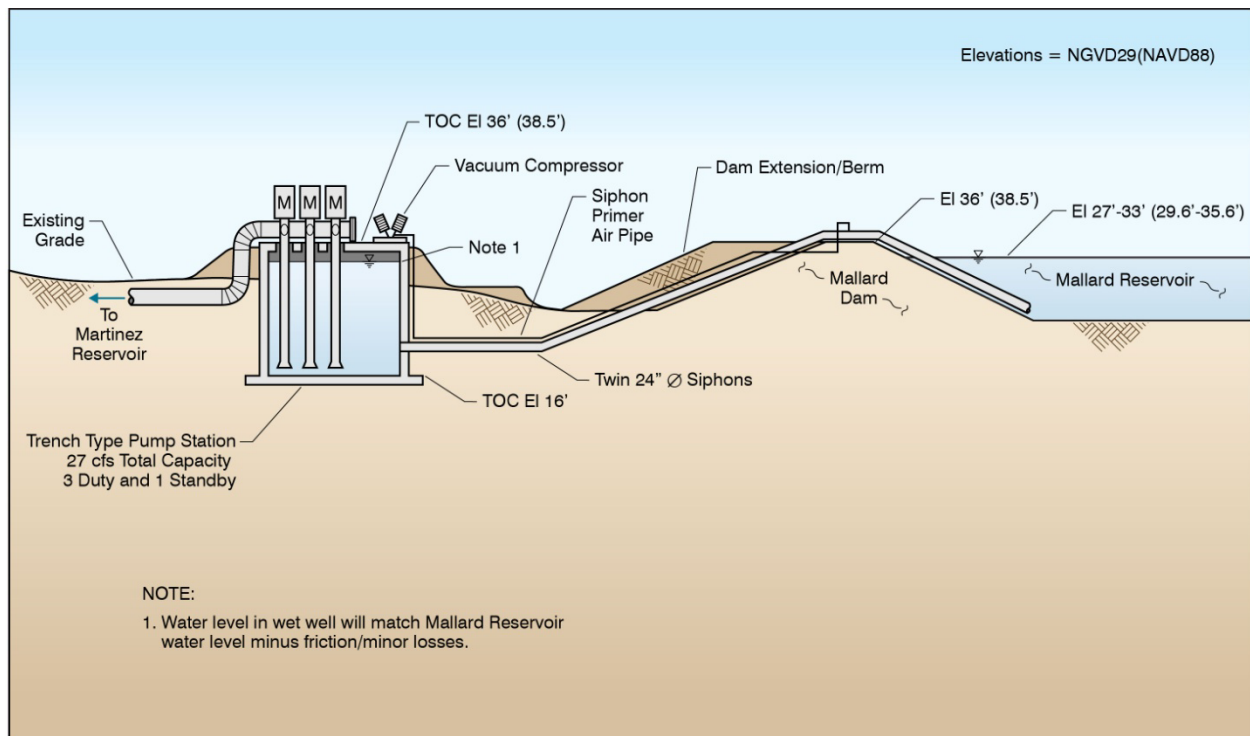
Loop Canal Redundancy Alternative B – Cross Section of New Pump Station
